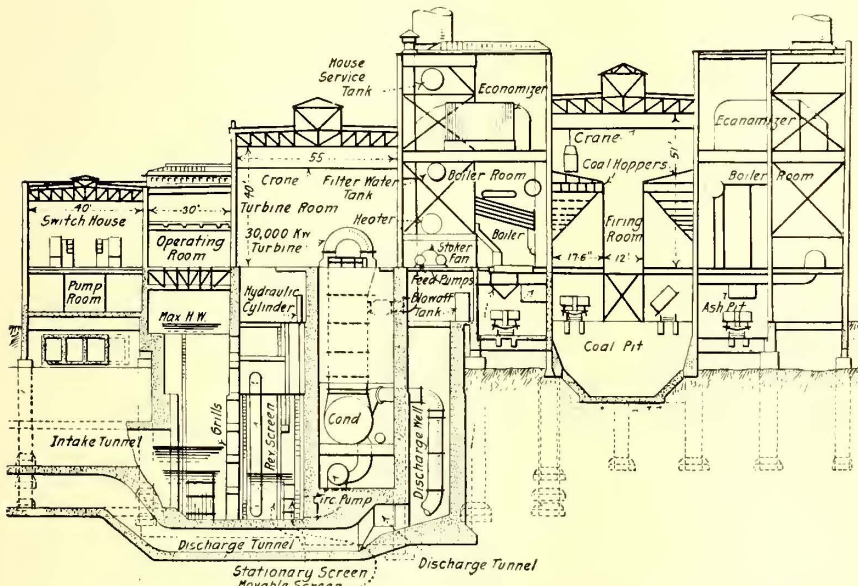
CROSS-SECTION THROUGH WINDSOR PLANT SHOWING COMPLETE ARRANGEMENT OF EQUIPMENT
